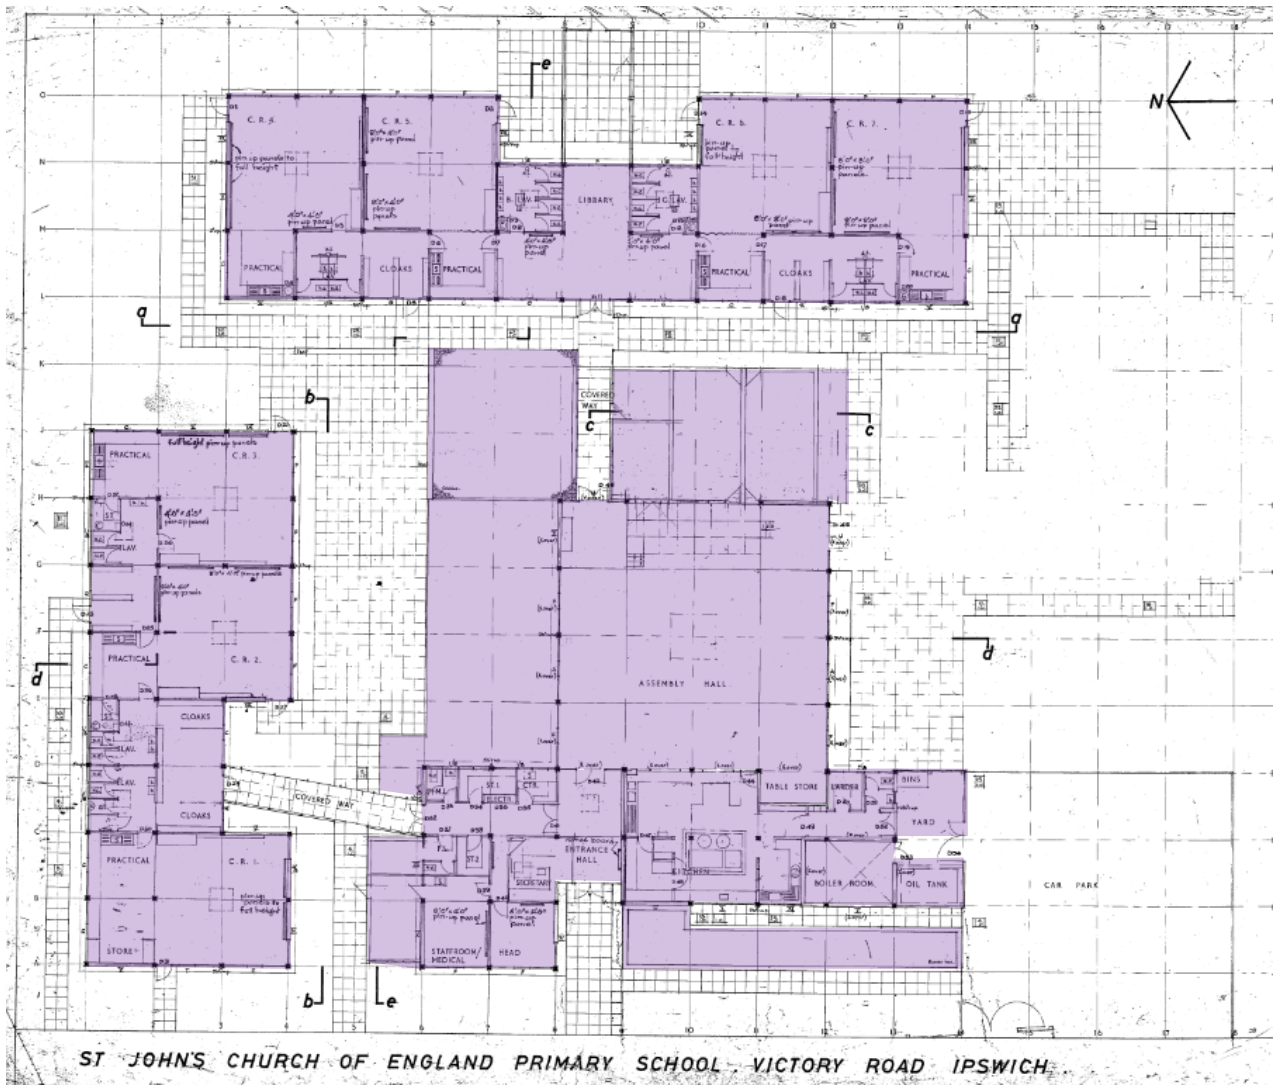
ST JOHN'S - ORIGINAL FLOOR PLAN (1961)
